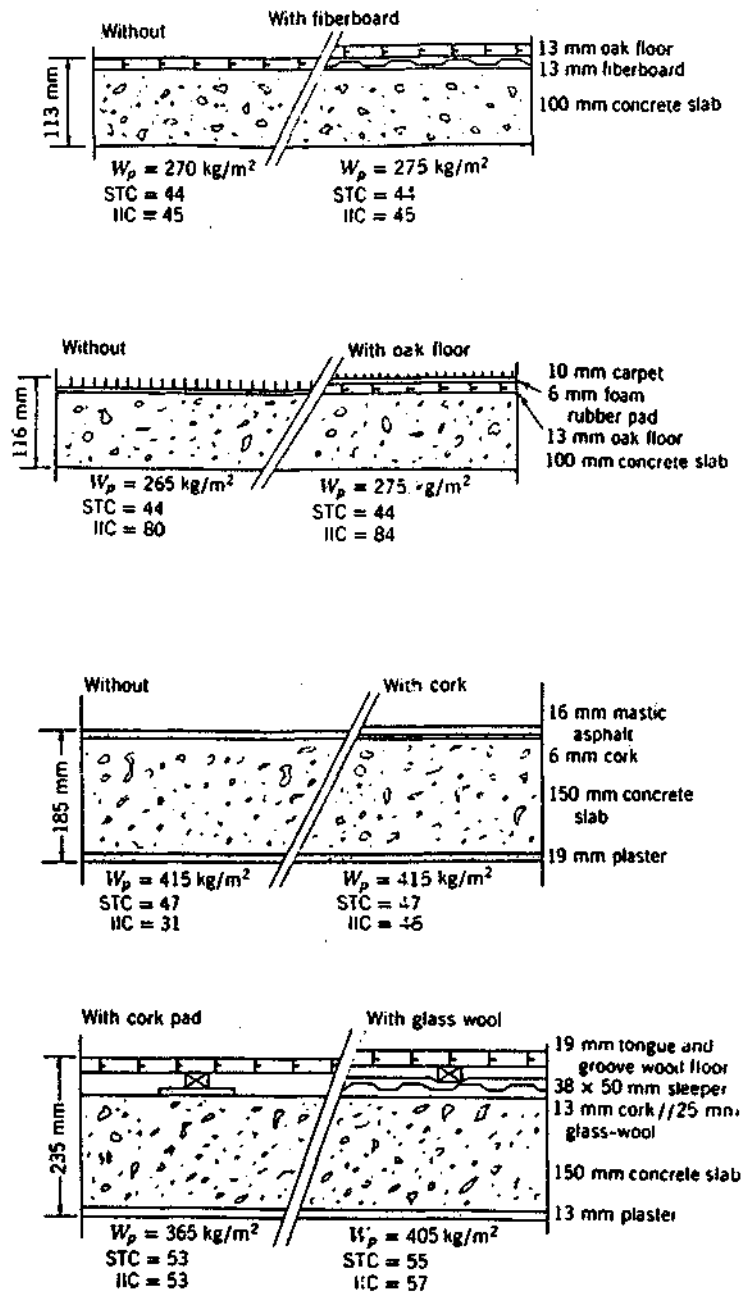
Sketches of concrete slab floor with resilient floor finish, Dolle (1972)
